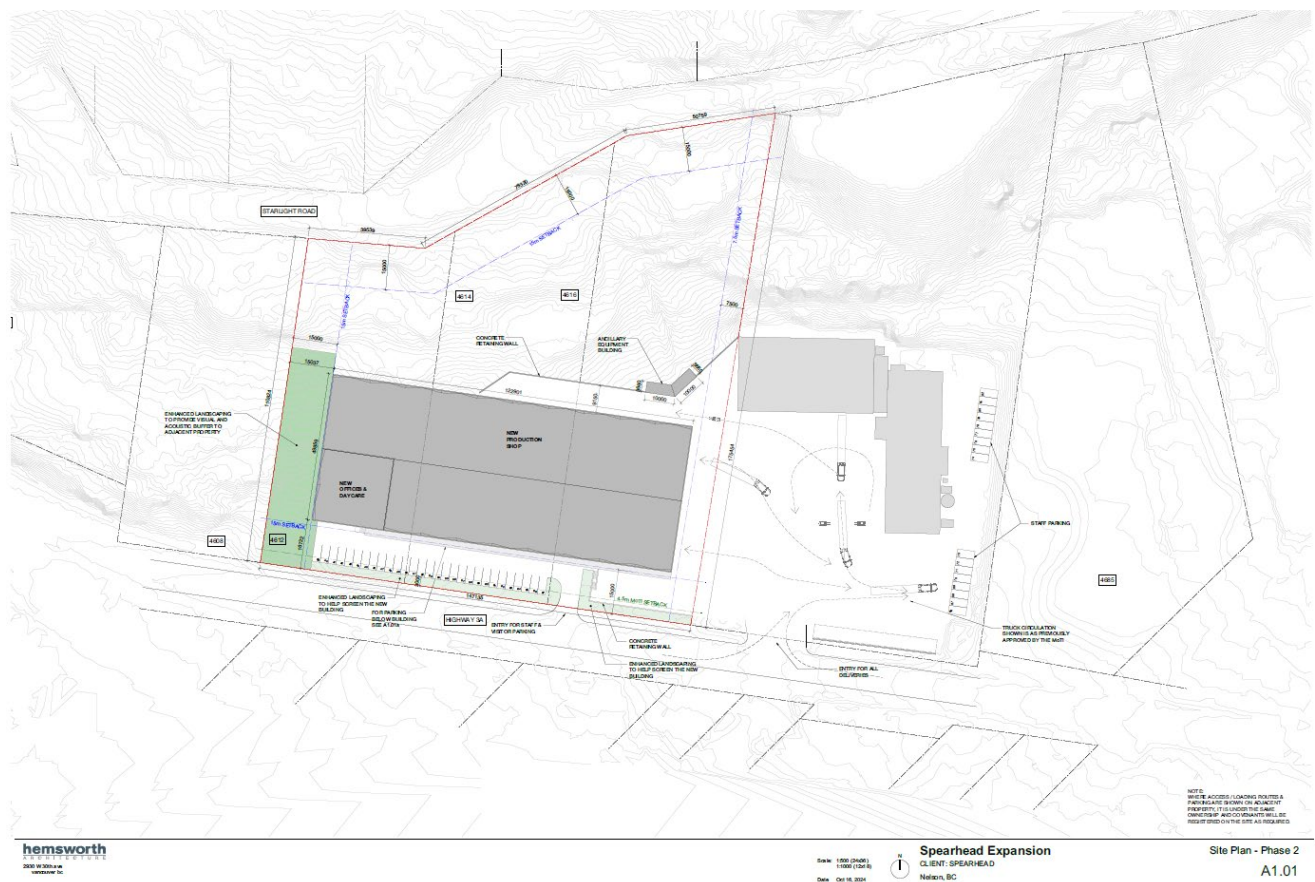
Site Plan showing the proposed development (note: full size site plan is included as Attachment 'C')
